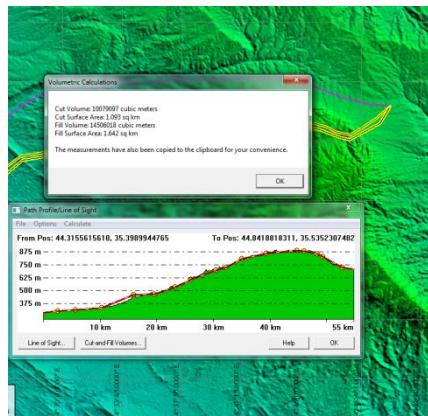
shows a longitudinal section and the earth to be removed or used in filling to the current road
